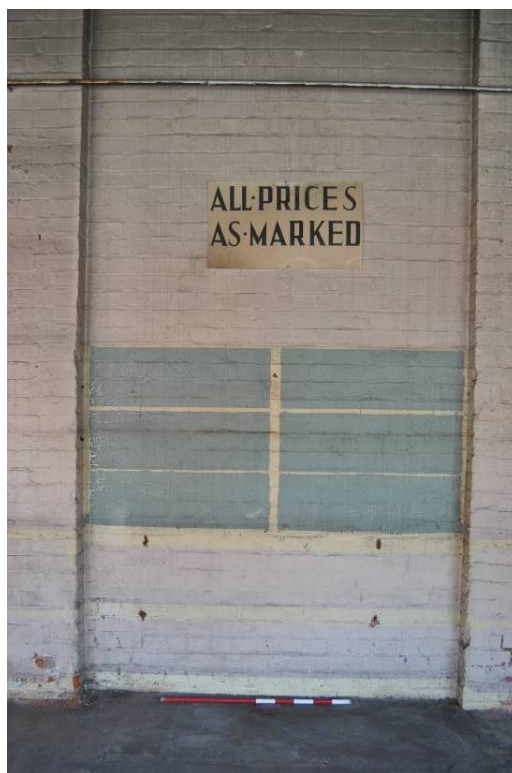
Building B, 'ghost' of former display shelving to south wall.
